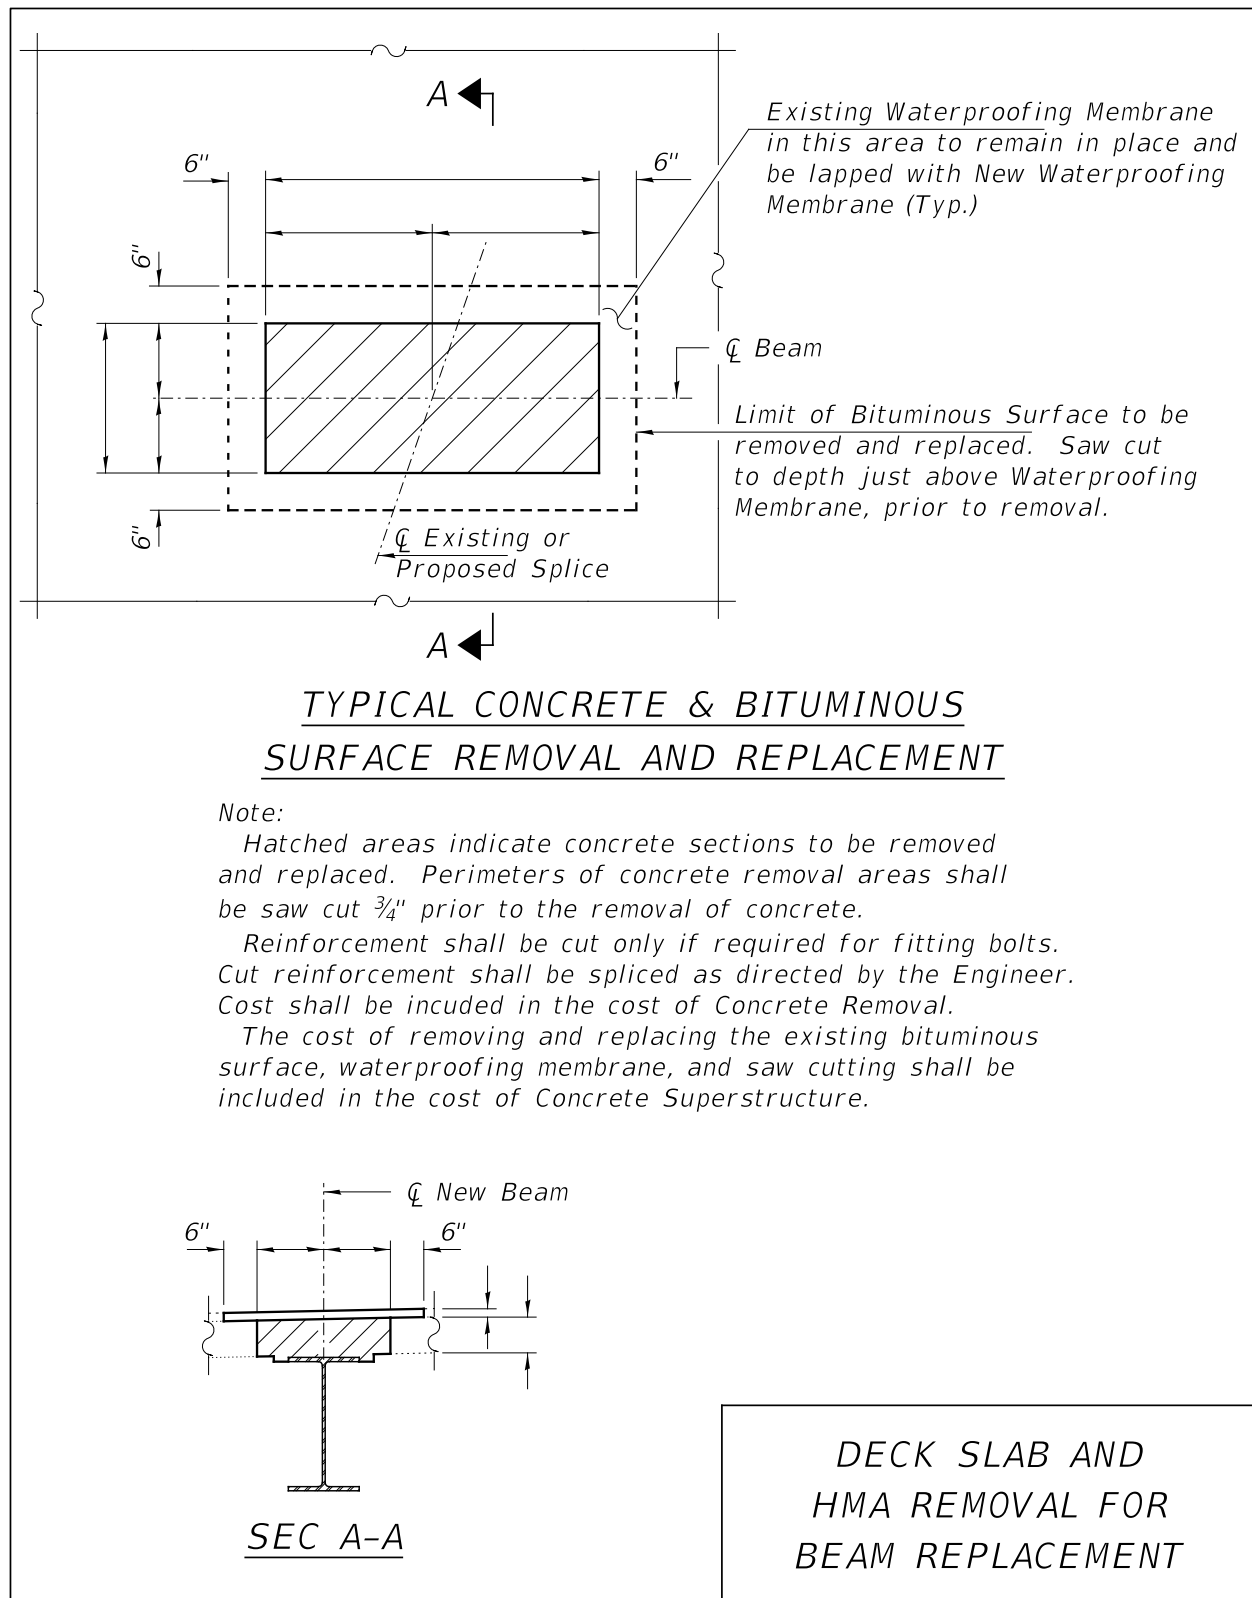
Deck Slab and HMA Removal for Beam Replacement
